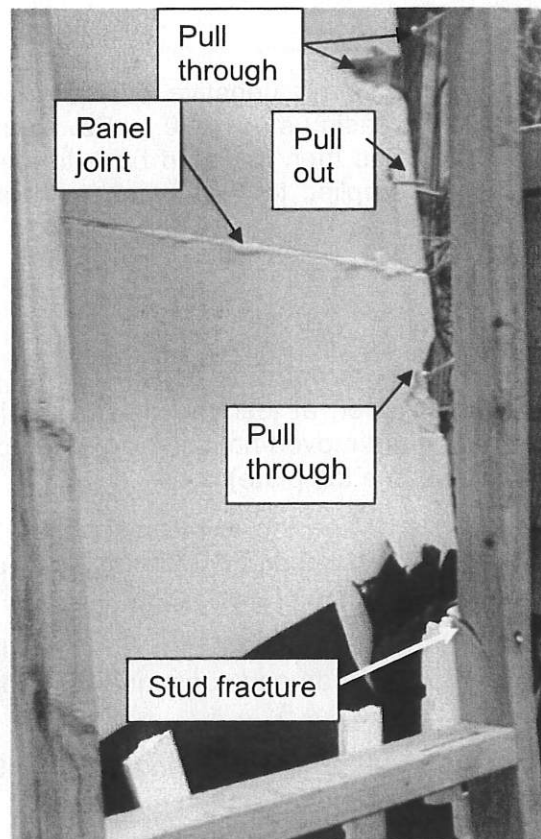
View of Stud fracture, panel joints, batten packers, screw pull-through and pull-out.
